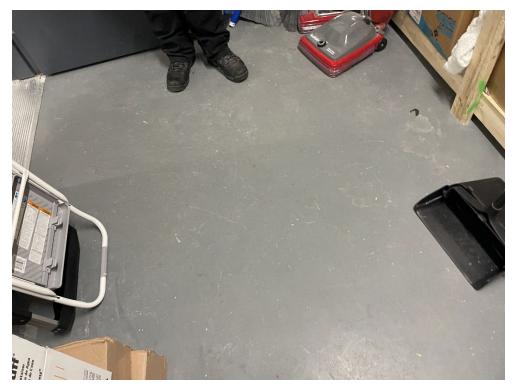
Photo of the concrete slab in a storage room in the Site's cellar.
